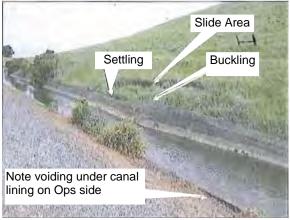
Side/lining buckling and settling looking upstream from ops road (GEI 2011).
